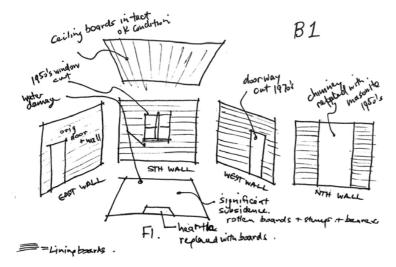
Sketch of 1952/3 Interior Modifications to Bedroom 1
